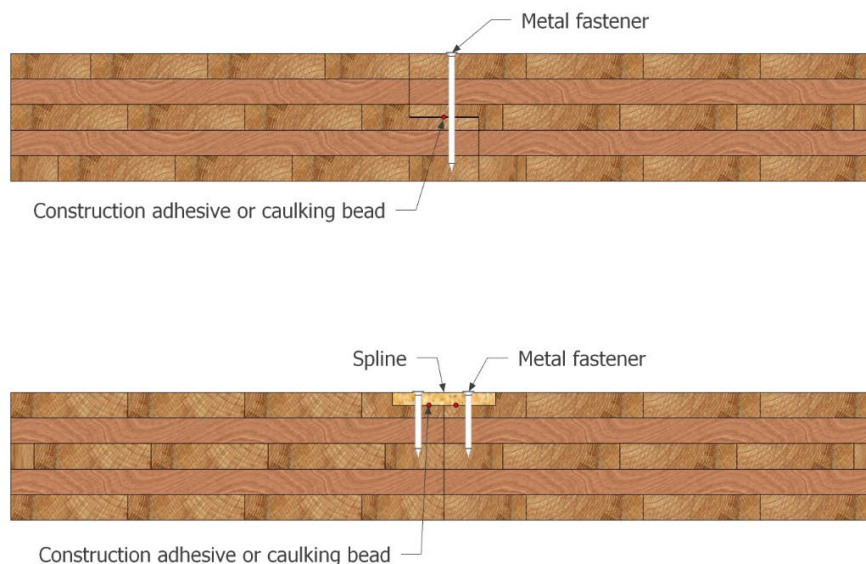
CLT joint details, per National Building Code 2020 provisions.
